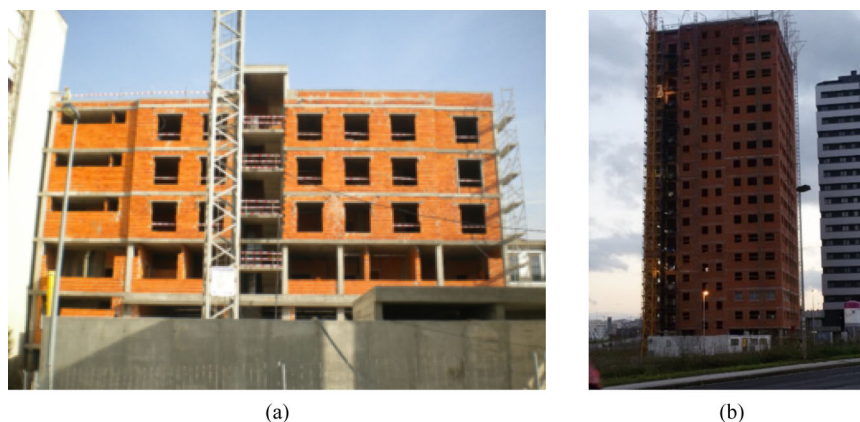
Examples of buildings built with HCHB: (a) residential and commercial 5-storey building in Portugal (Portugal); (b) residential 17-storey building in Coruna (Spain).
